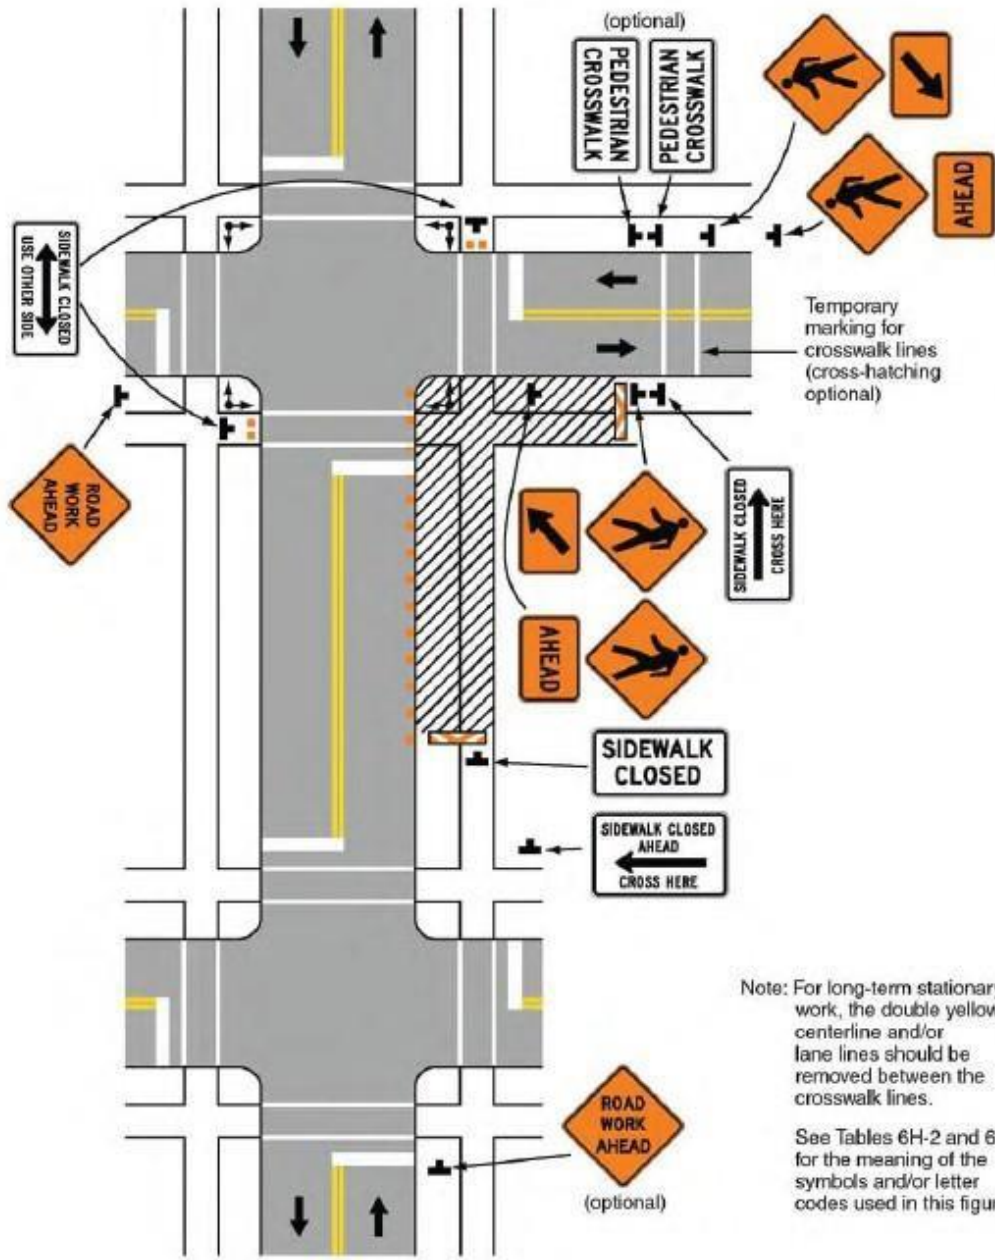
H-28. Sidewalk Detour or Diversion (TA-28)
